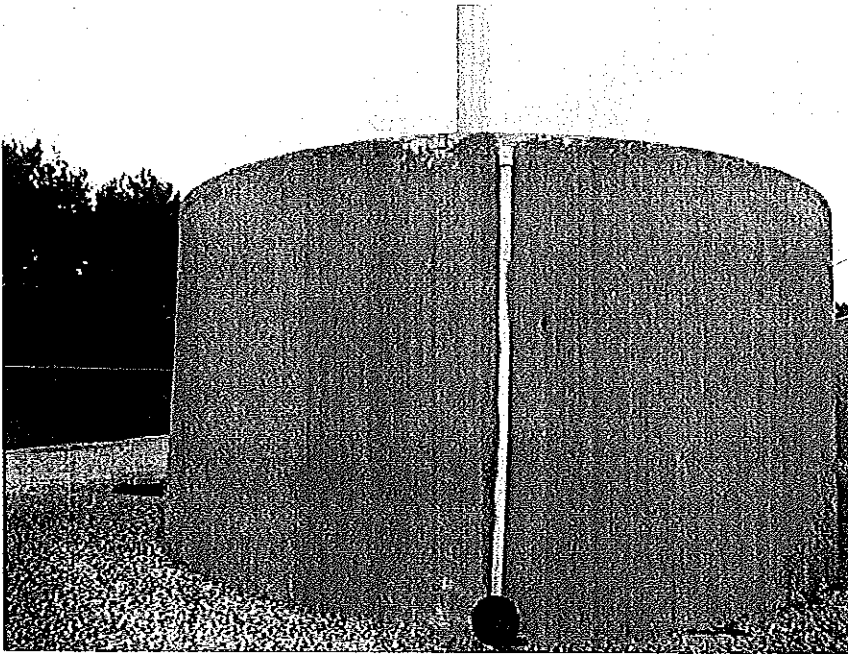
Overview of Tank 3. Note the horizontal cracks at the wall-to-cap transition.
